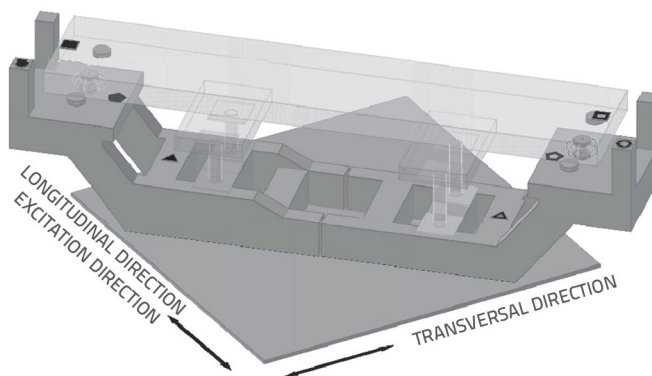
Longitudinal and transversal sections of the GHS bridge model
